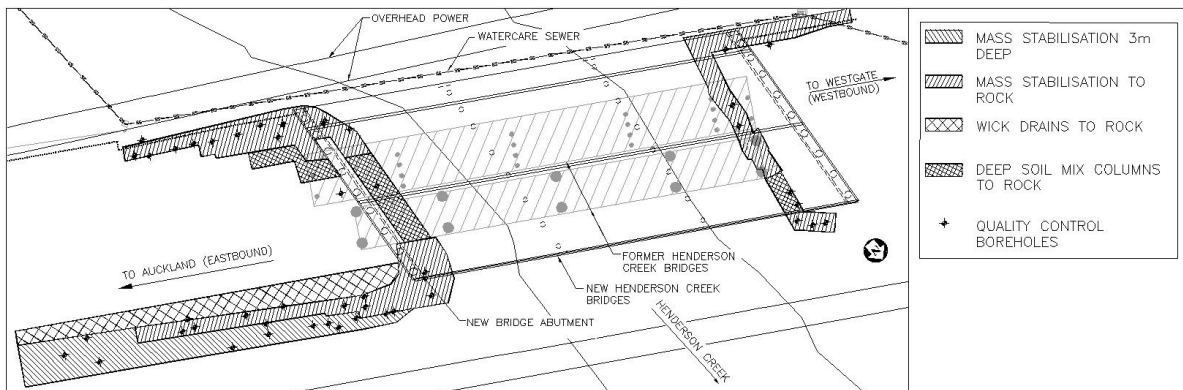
Plan of ground improvement at Henderson Creek Bridge.
